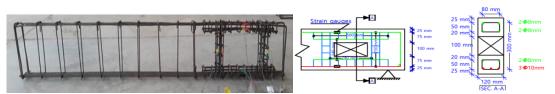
Strengthened beam (B3) using steel beams around the opening. Beam (B4) was provided with reinforced steel beams at the upper and lower of opening where the upper and lower reinforced steel beams with length [500 mm]. A steel box was used made of steel rods with diameter 8 mm with internal dimensions [240 x 80 x140 mm] and with steel wire mesh fixed around the box as shown in Fig. 5 and fig. 6.
